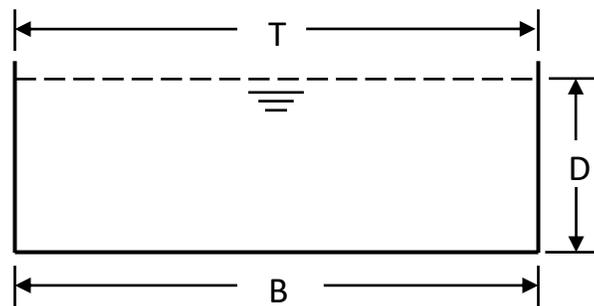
Typical Rectangular Cross-Section of an Open Channel
